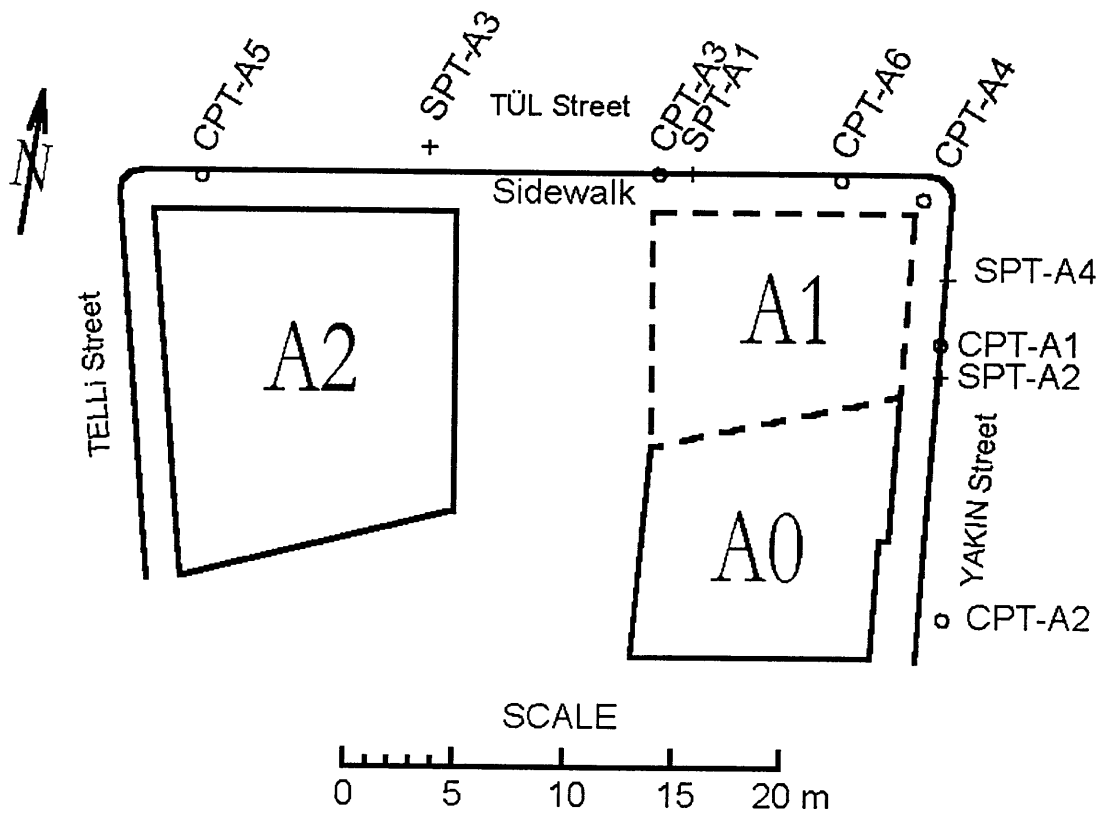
Plan view of Site A and location of subsurface exploration points.
